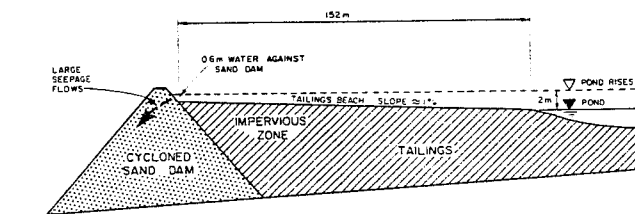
Sketch Illustrating Flooding of Tailings Beach by Surcharge in Tailings Pond
